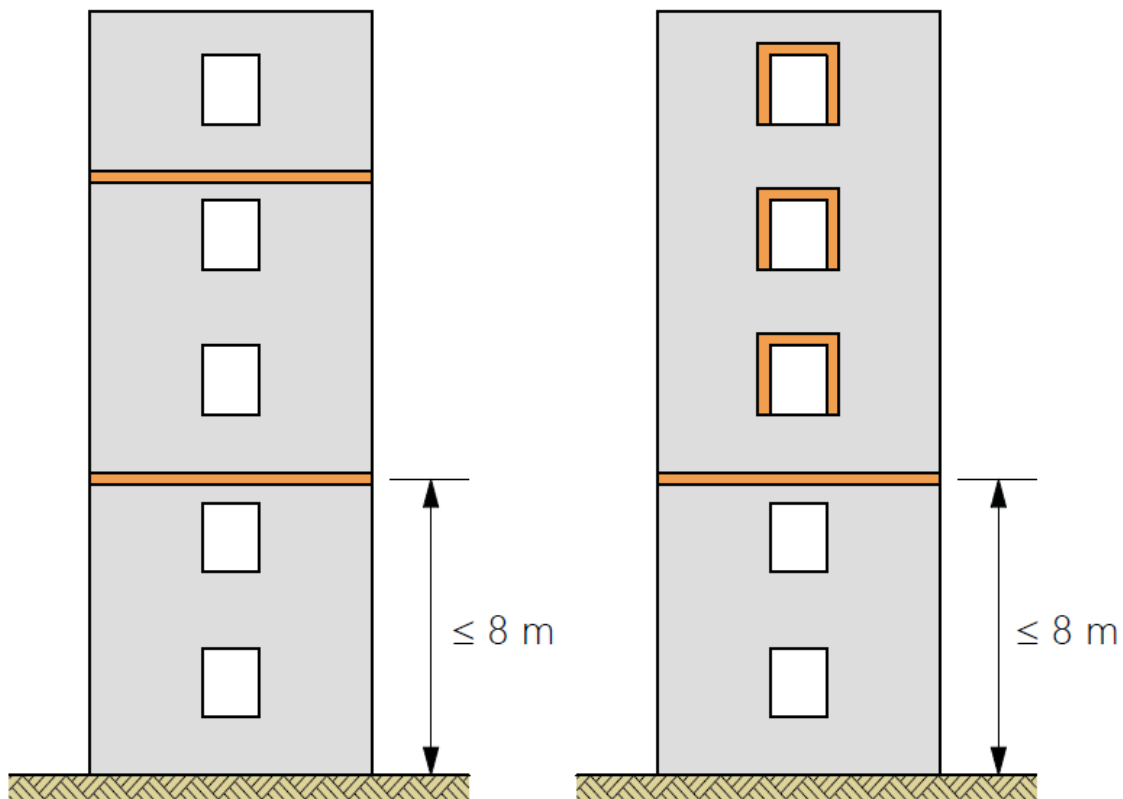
Standard solution for facades of mid-rise buildings with a continuous air cavity.
